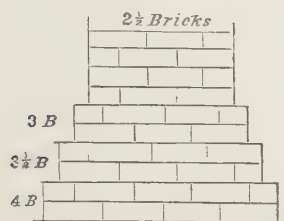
Footings, 1' 10 $\frac{1}{2}$ "-wall.
